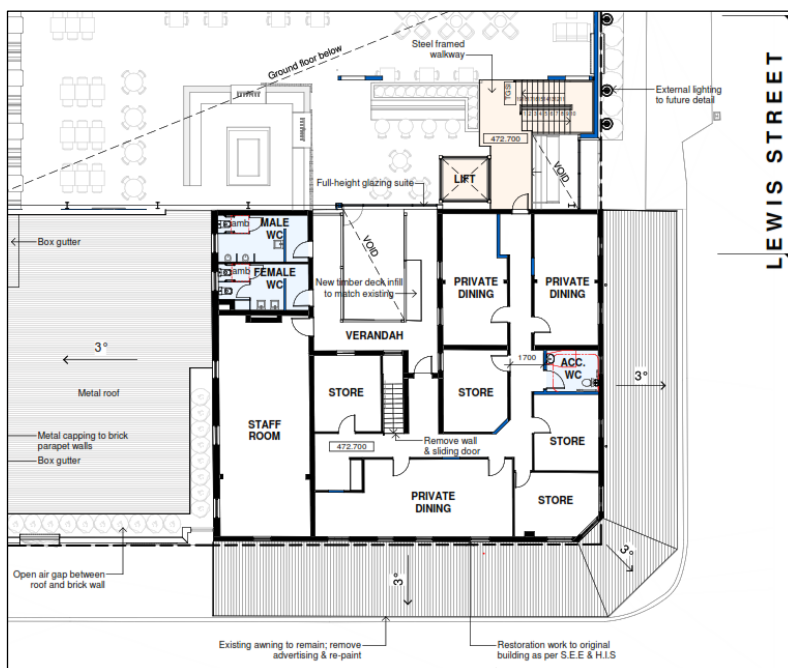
Approved Federal Hotel First Floor Alterations Plan, see Dwg No. DA 102
